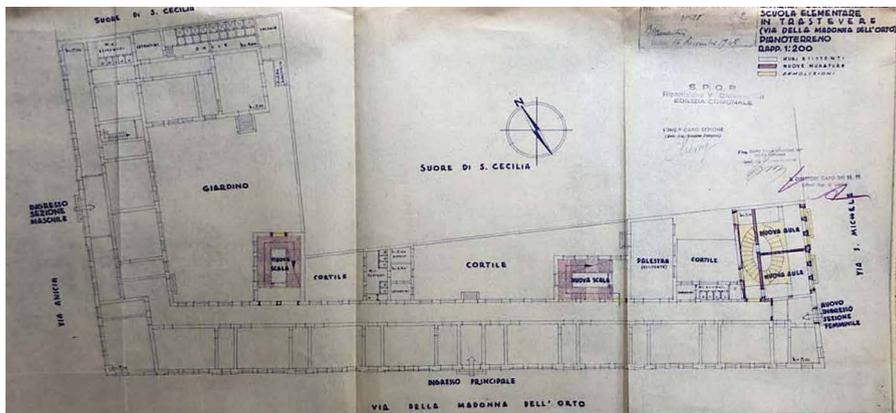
Plans and elevations of the building's floor addition project, 1953 (Archivio Ex V Ripartizione del Comune di Roma).
